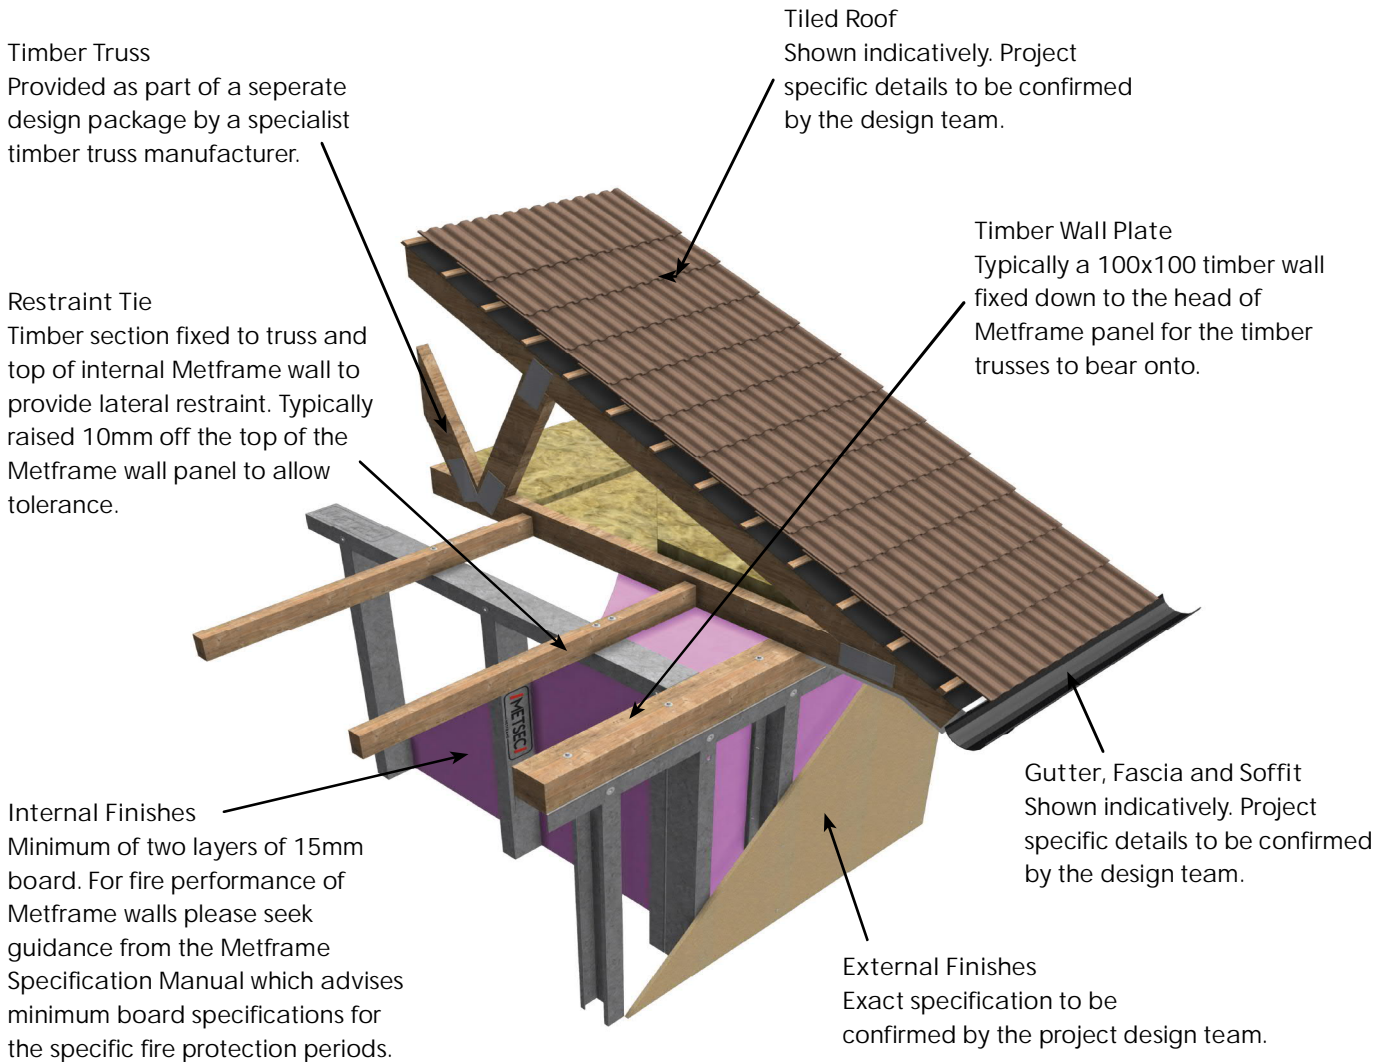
TIMBER TRUSS ROOF DETAIL VIEWED INTERNALLY
